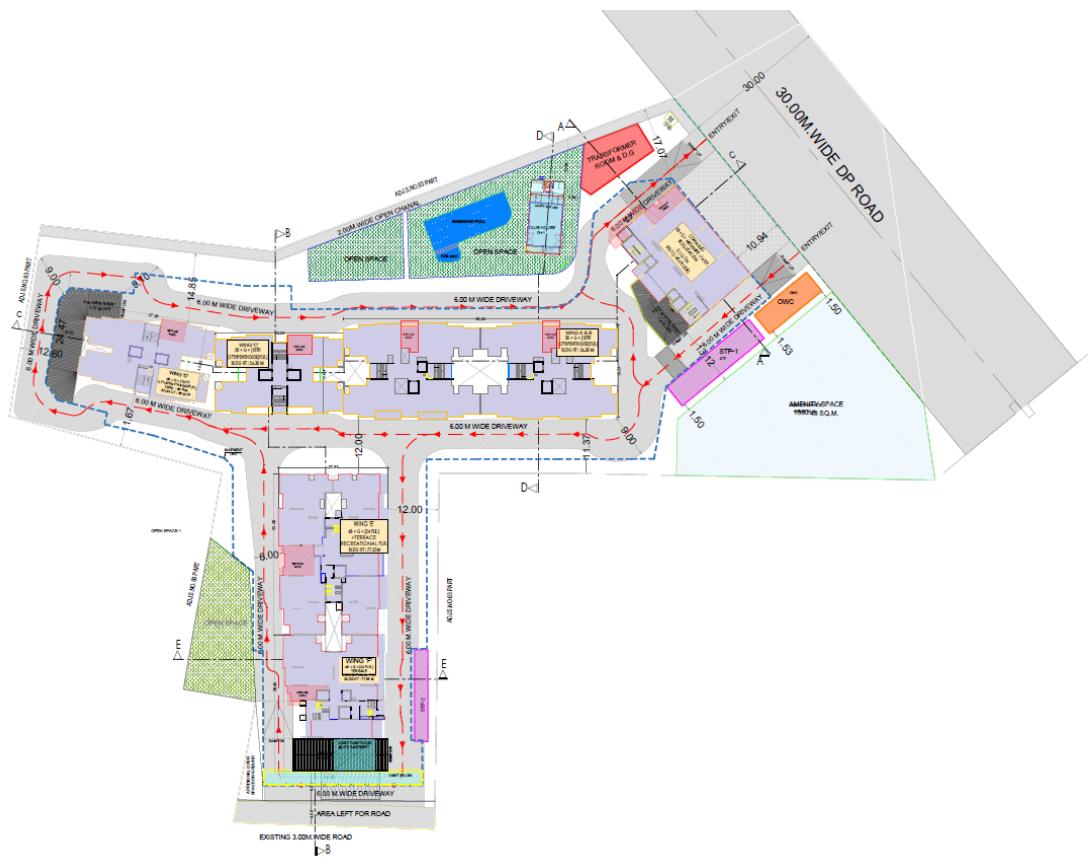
PROJECT SITE LAYOUT PLAN
